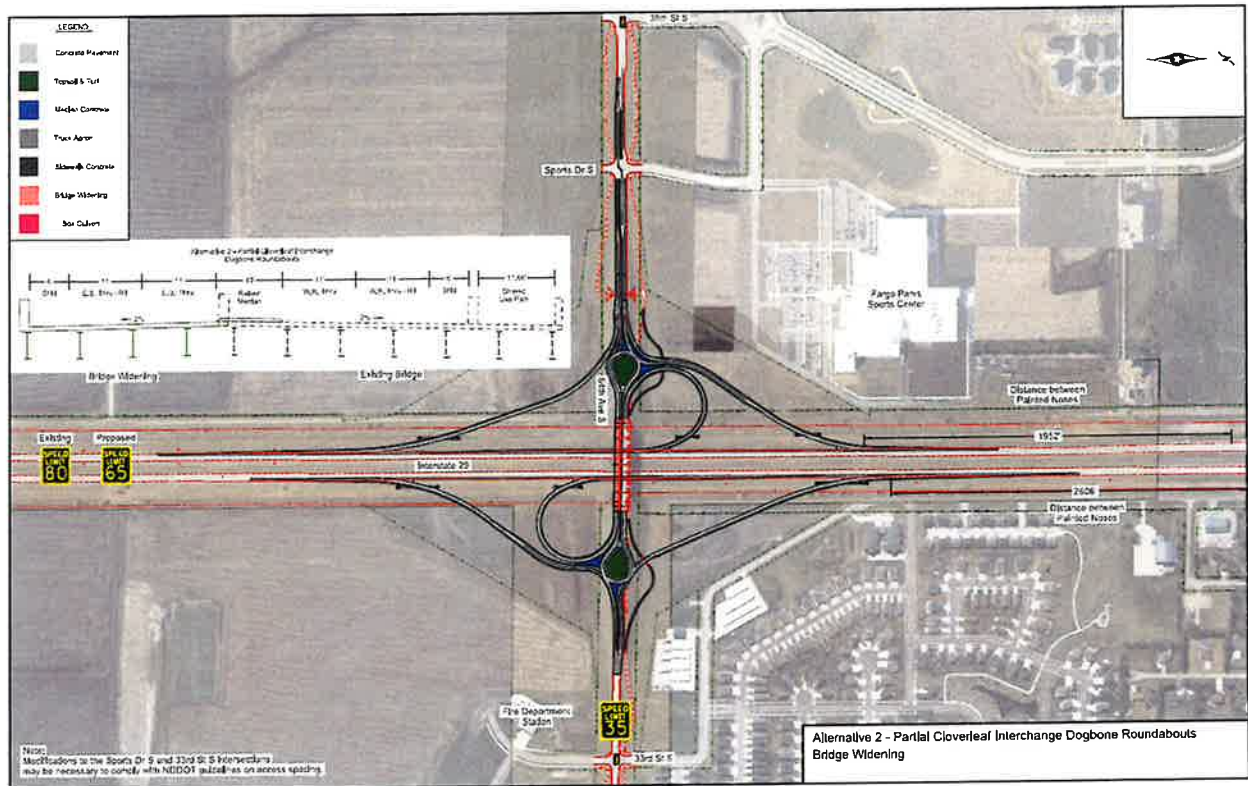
Alternative 2 Proposed Layout & Typical Section
